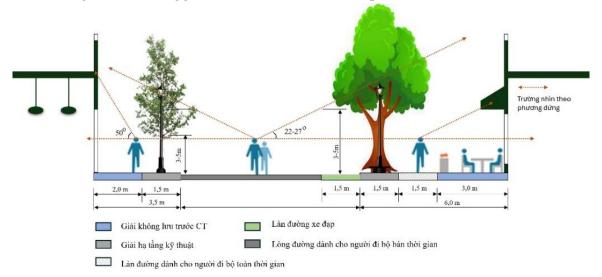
Illustration of cross-section of trees planted on walking streets
